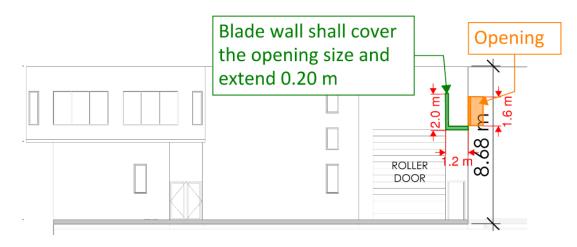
Location and Dimensions of Blade Wall and Slab
